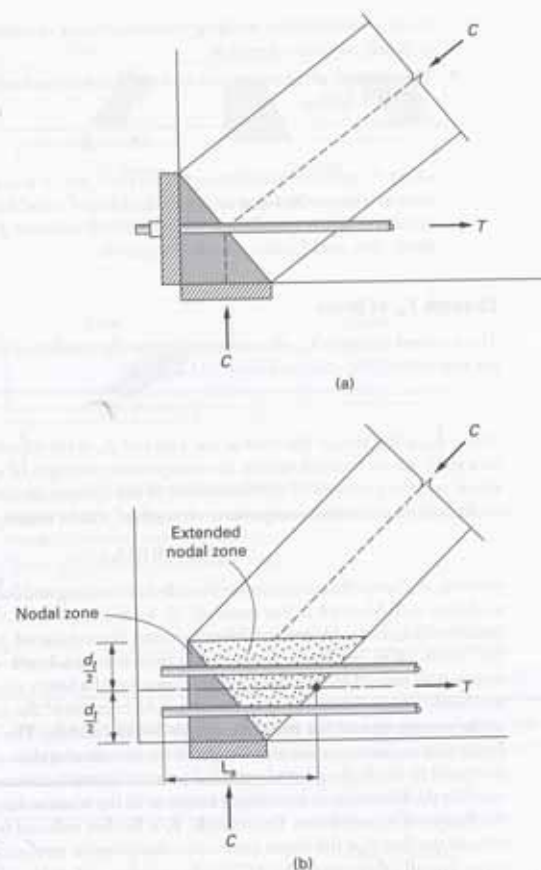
Anchorage of tie reinforcement: (a) anchored by a plate; (b) anchored by bond.
